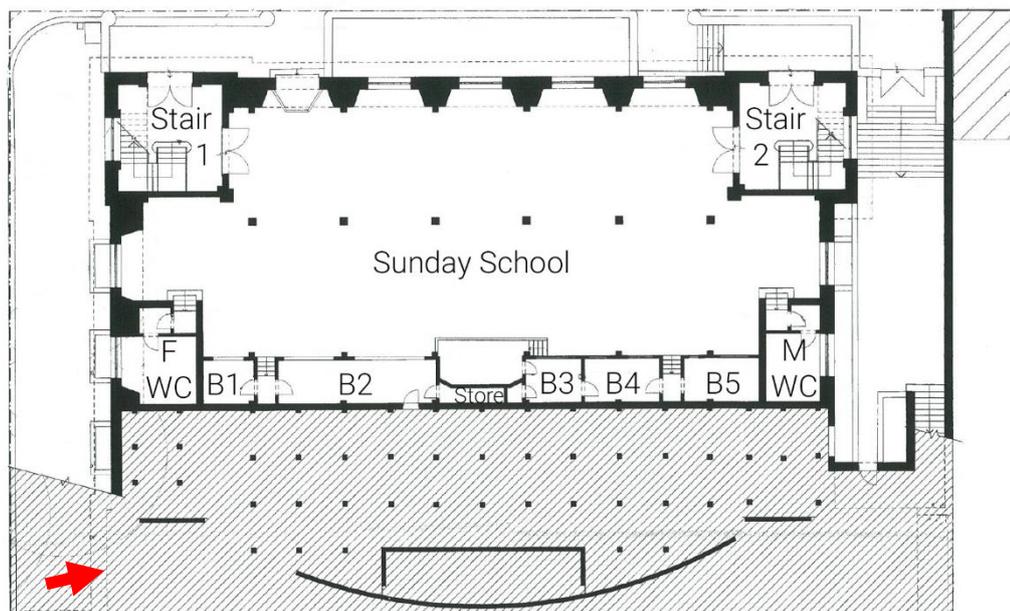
Basement Floor Plan. (Source: BatesSmart plan with notes by NBRSARCHITECTURE)
